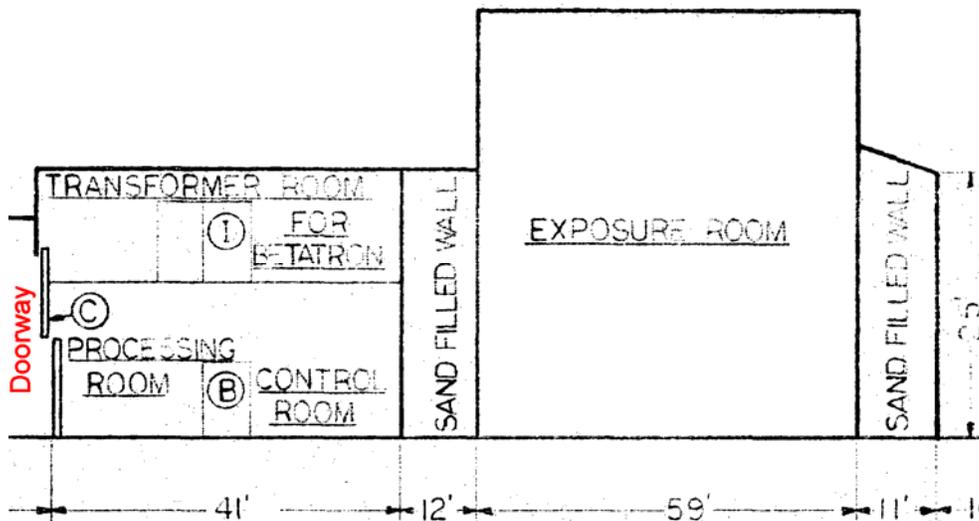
Elevation Drawing of New Betatron Building—Detail (NRC 2009)
